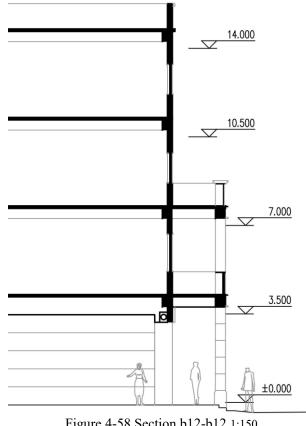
Section b12-b12 1:150 (Source: Drawn by the Author)
